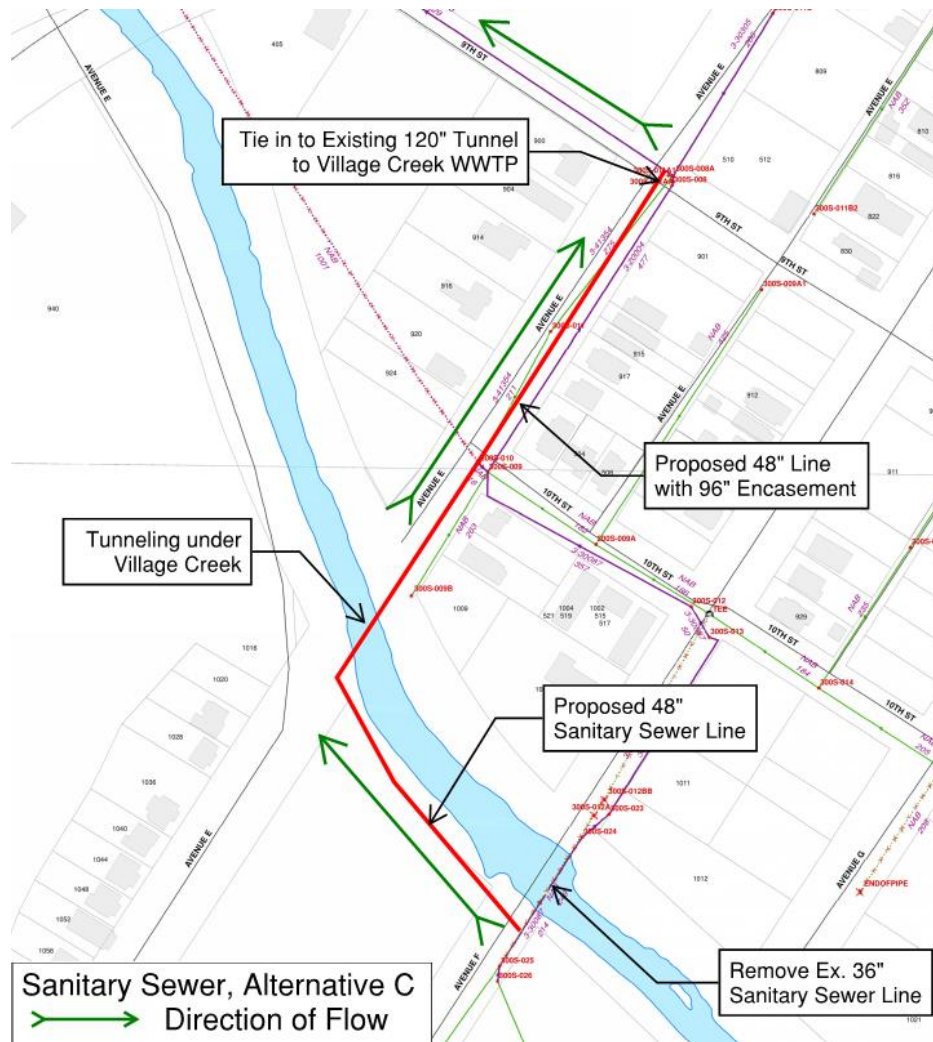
Proposed Sanitary Sewer Alternative C; Also see Exhibits for plan and profile of Alternative C.
